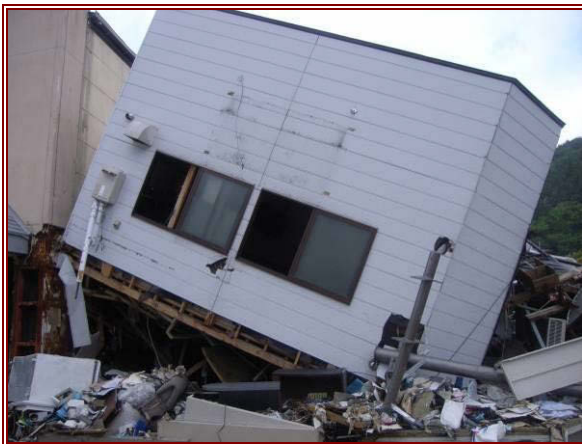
(left) Soft story collapse of timber structure. Upper floor intact because of central steel strengthening beam supporting the second storey.
